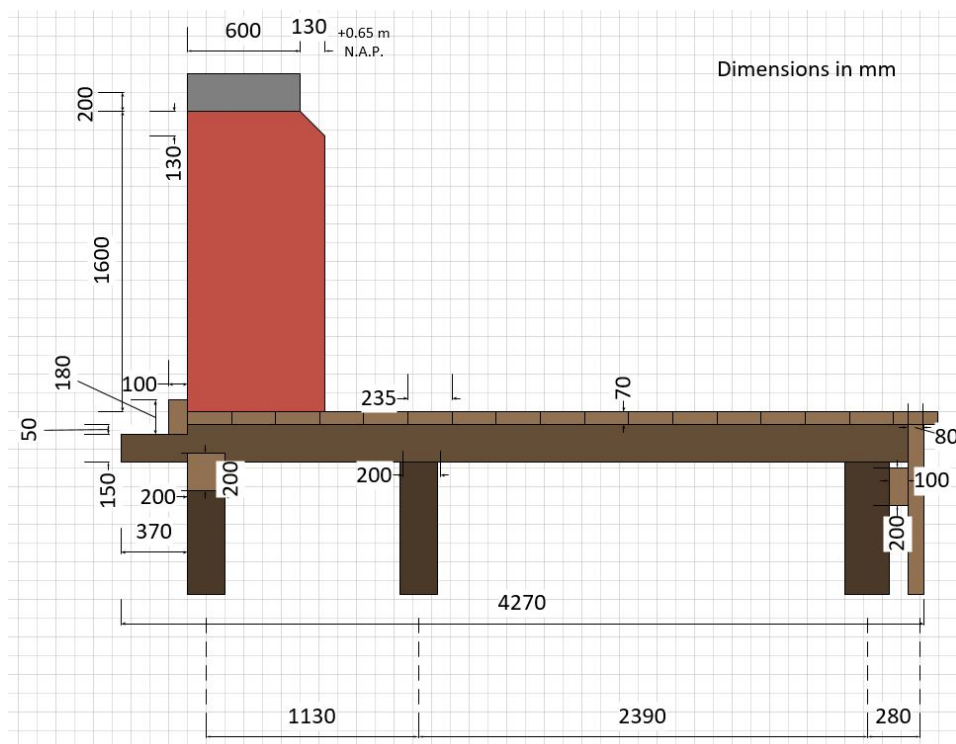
Schematisation cross-section quay wall Herengracht, dimensions in mm
